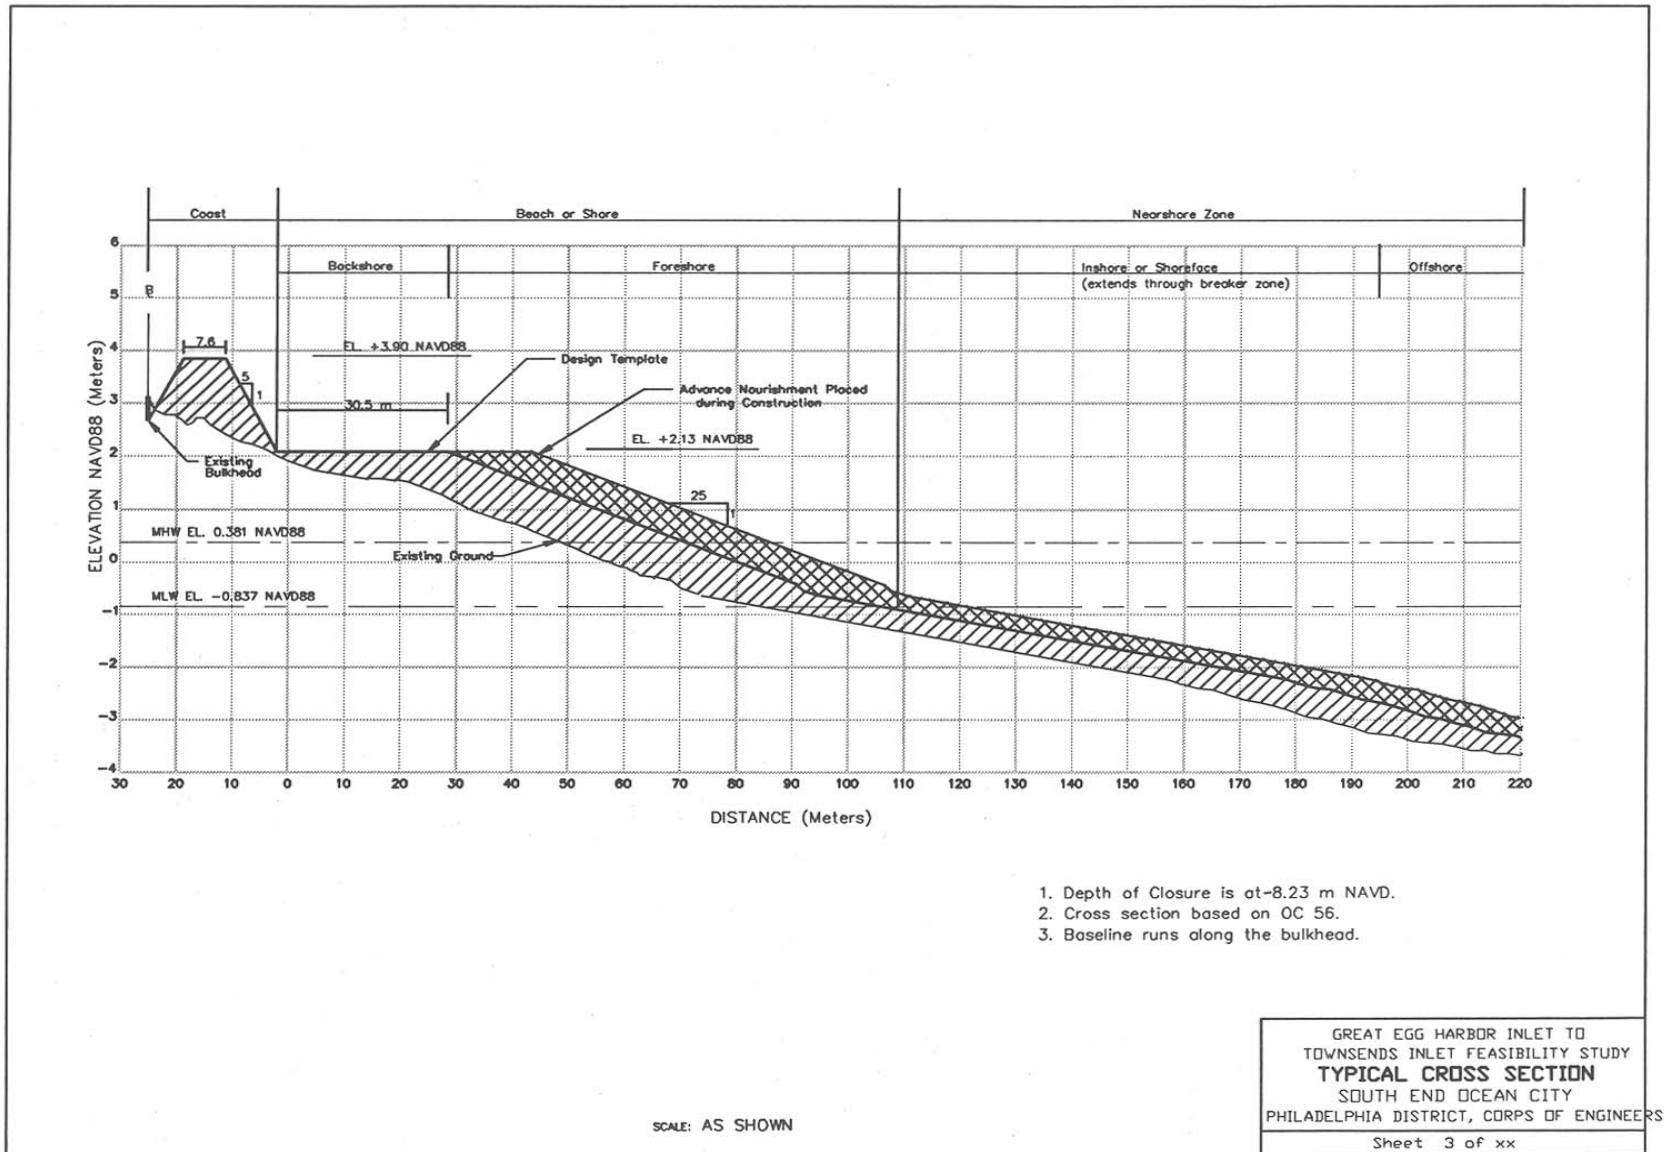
Selected Plan for Ocean City, NJ - Typical Design Cross Section, 34th – 59th Street
